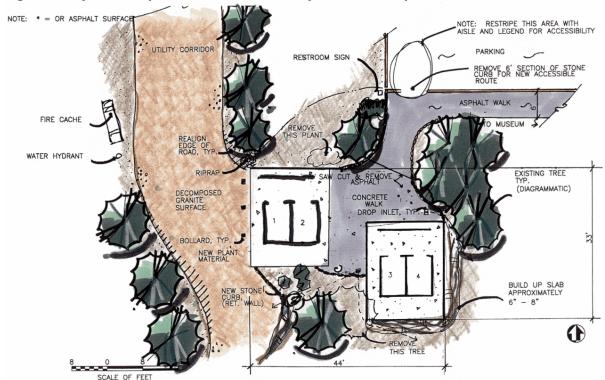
Proposed Tusayan Museum restroom site plan, Grand Canyon National Park.
